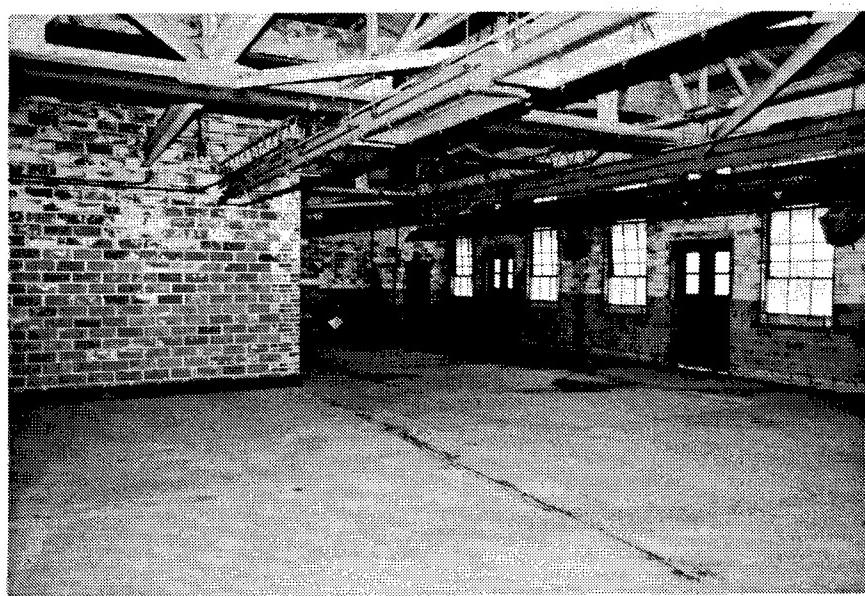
Building 2F-4: Interior view of this Primer Loading Building.
